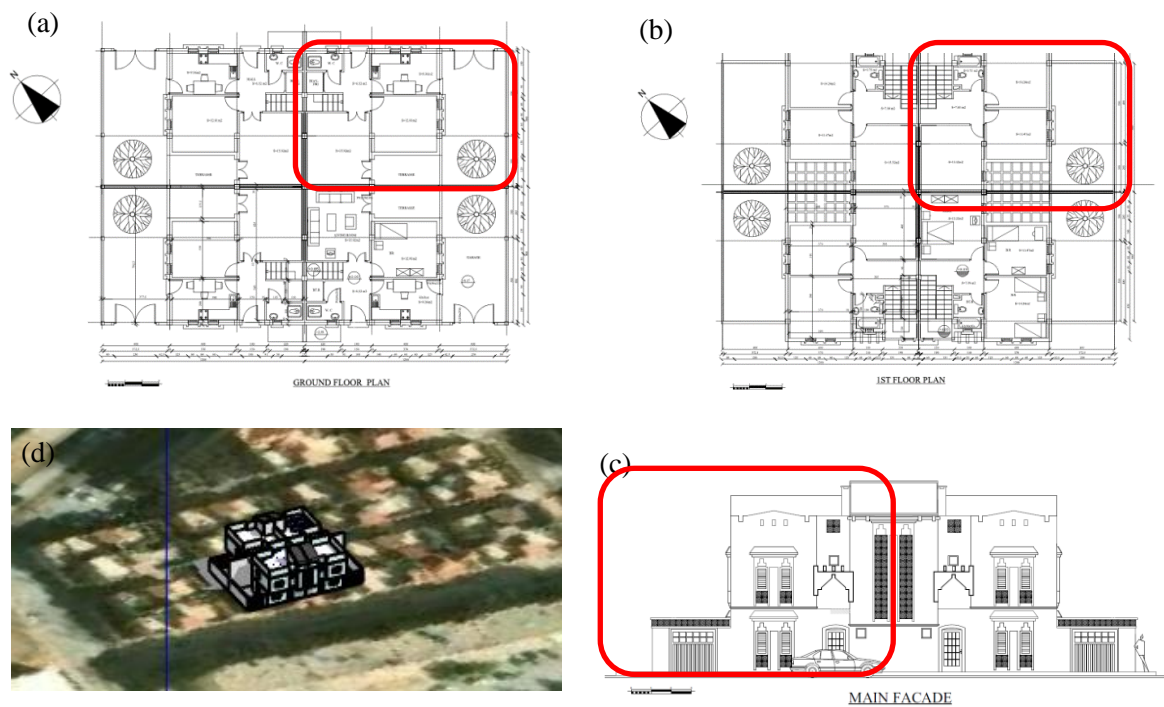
(a) the ground floor plan, (b) the first-floor plan, (c) main façade of the building, (d) 3d view,
